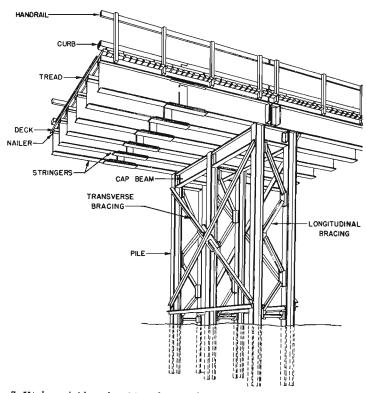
Highway bridge, class 25 or class 50, double-lane, steel stringers on steel pile pier.
